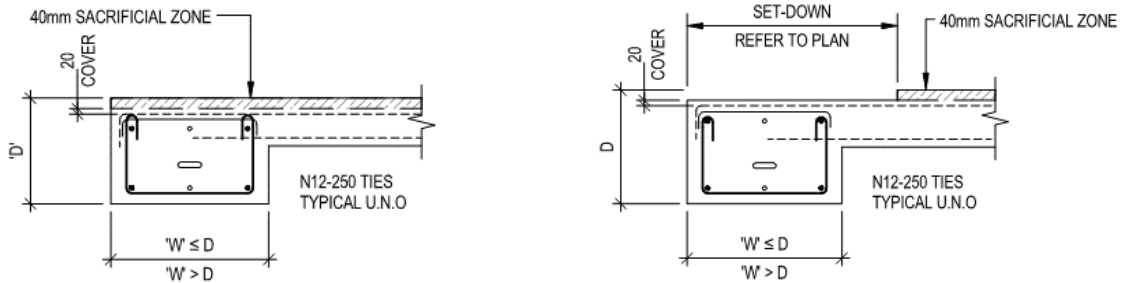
Typical edge beam detail with sacrificial topping. Figure 3.3.8b – Typical edge beam detail at set-down.
